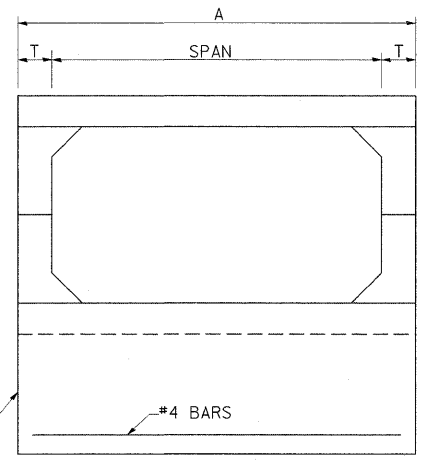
DETAIL OF PRECAST CONCRETE BOX CULVERT END SECTION
